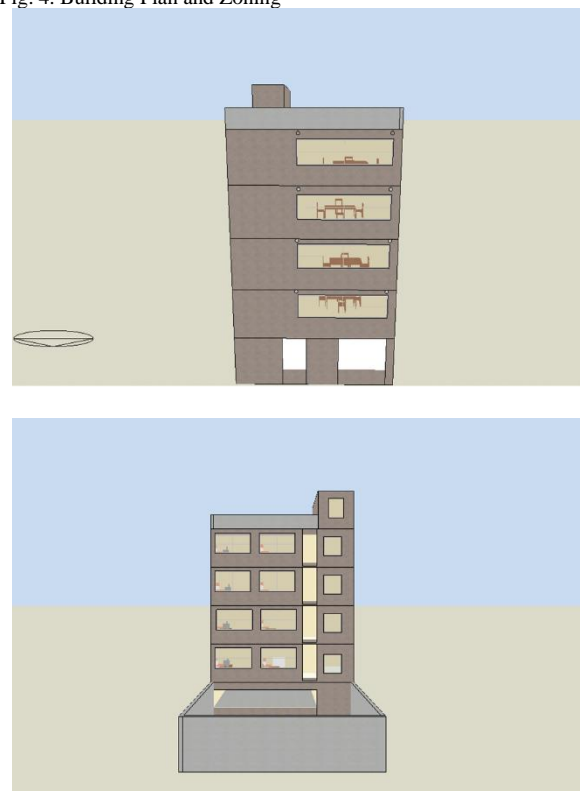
a) Northern Facade of the Building. b) Southern Facade of the Building
